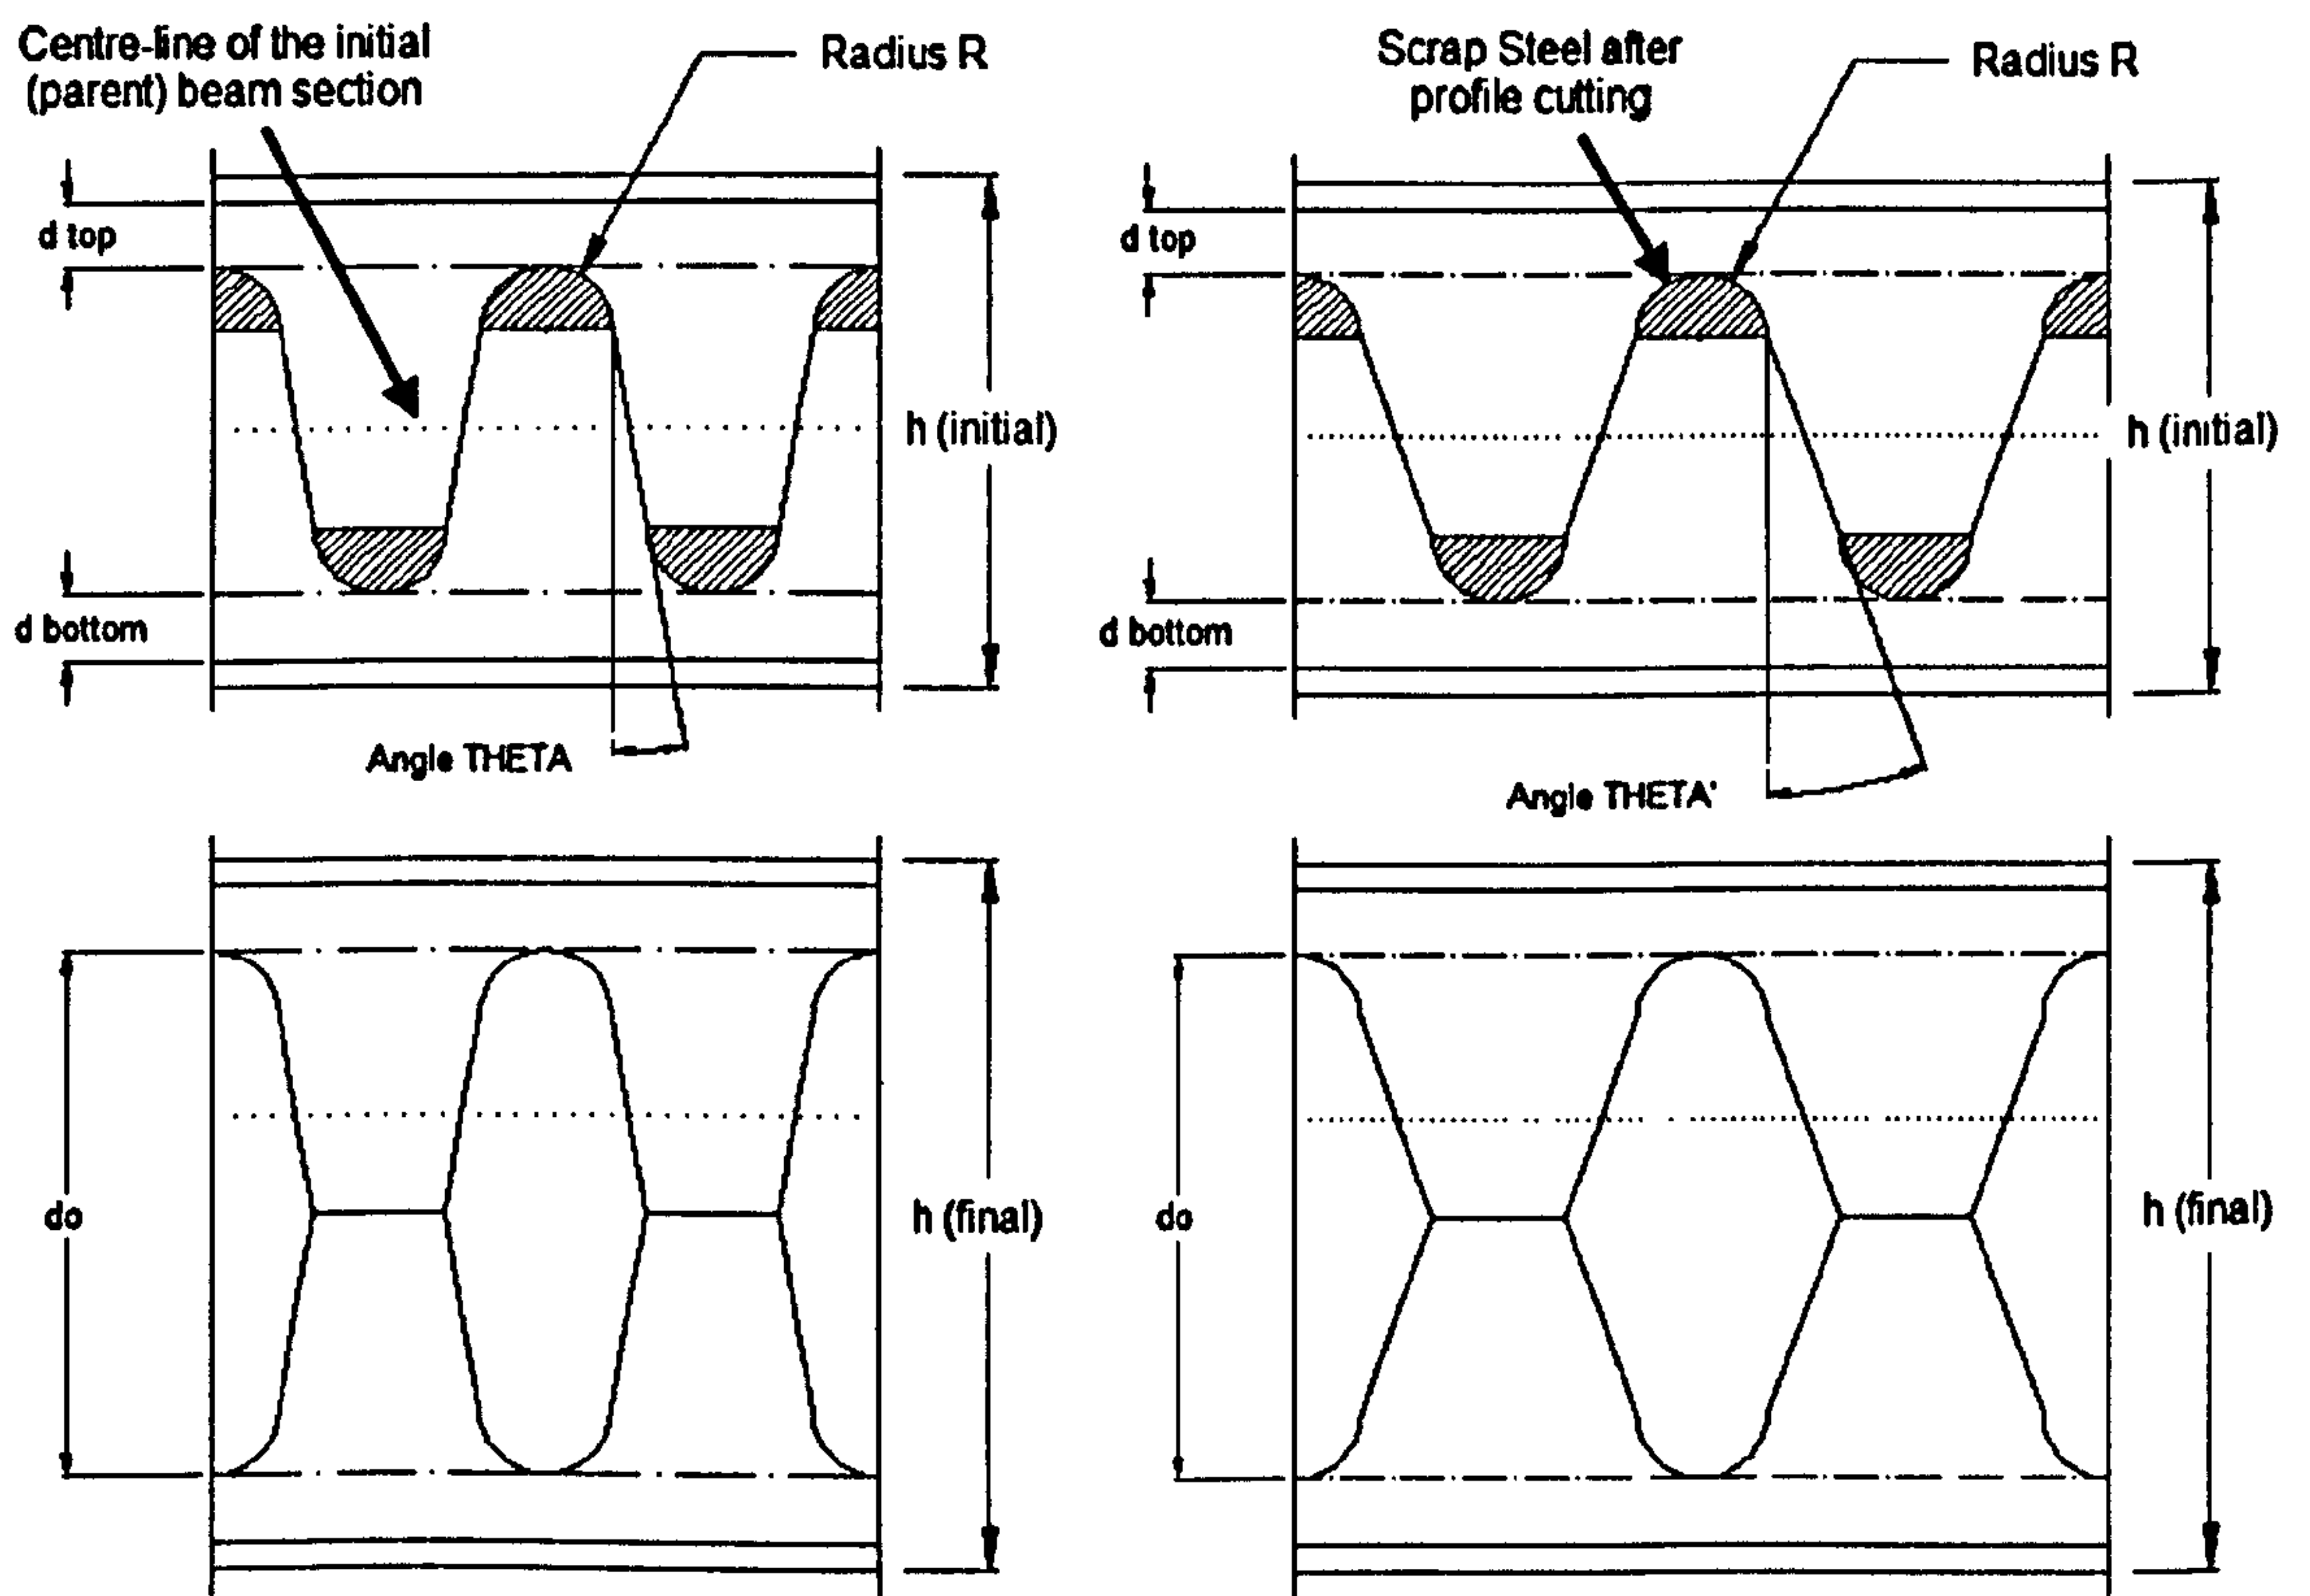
Example 2. Cutting profiles with standard welding length (new profile cut)
